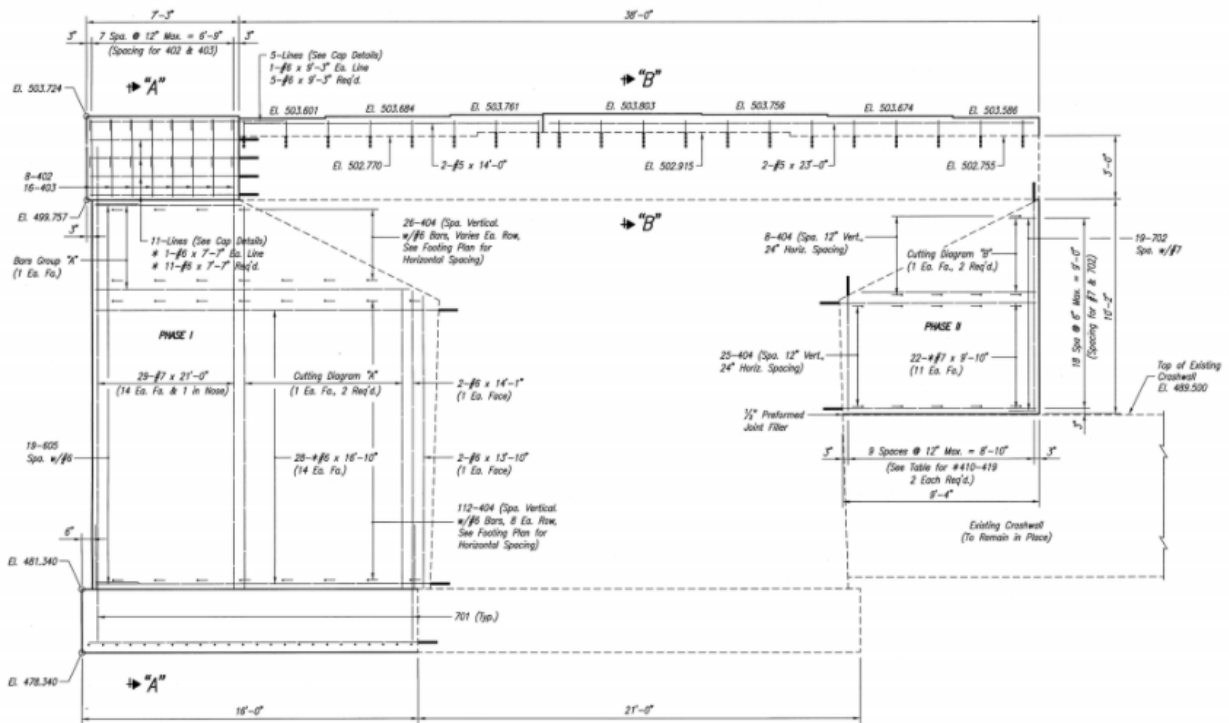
Transverse Elevation of Interior Pier (NBI 41130) (2015)
